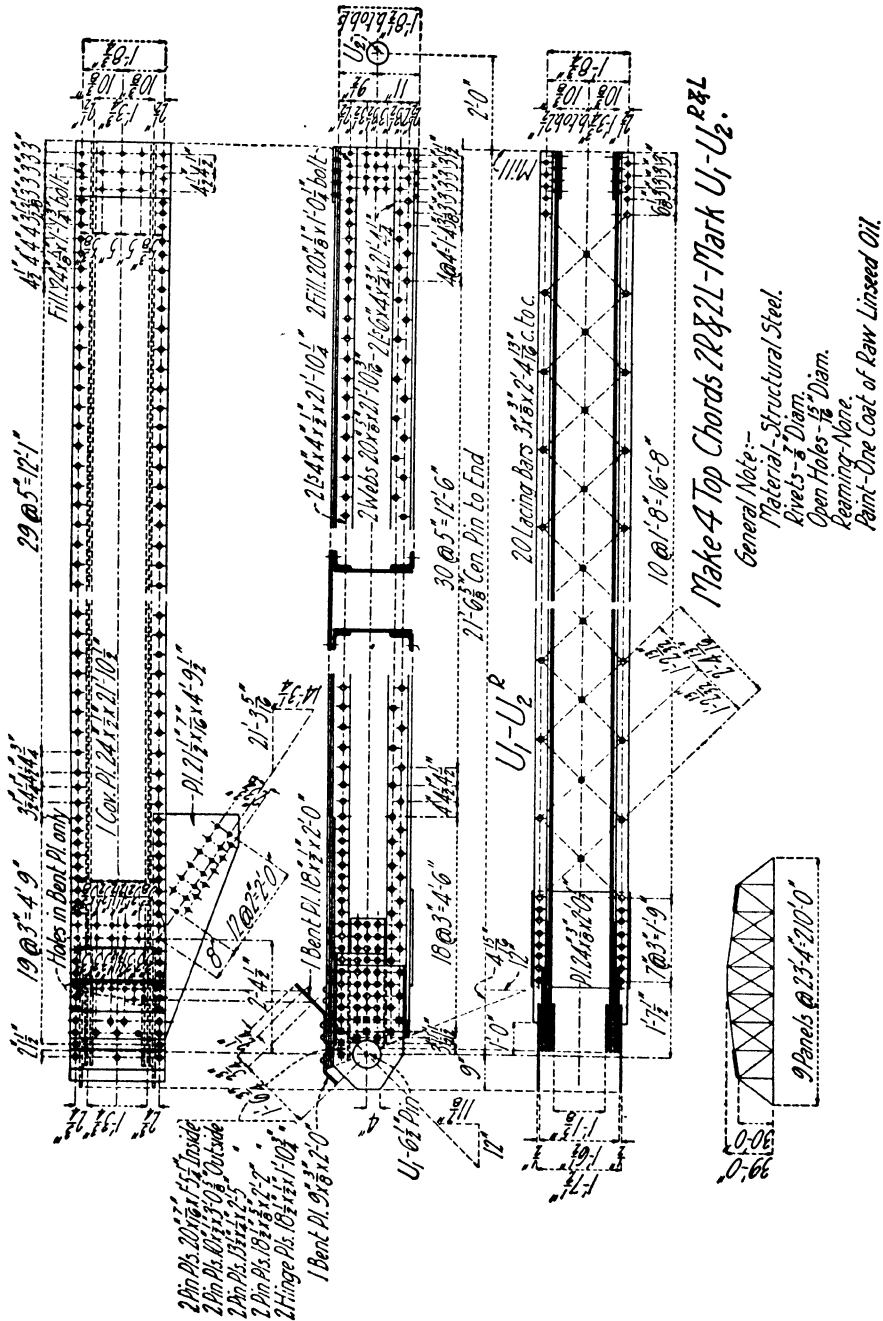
STANDARD MARKING AND ERECTION DIAGRAM FOR A TRUSS BRIDGE.
